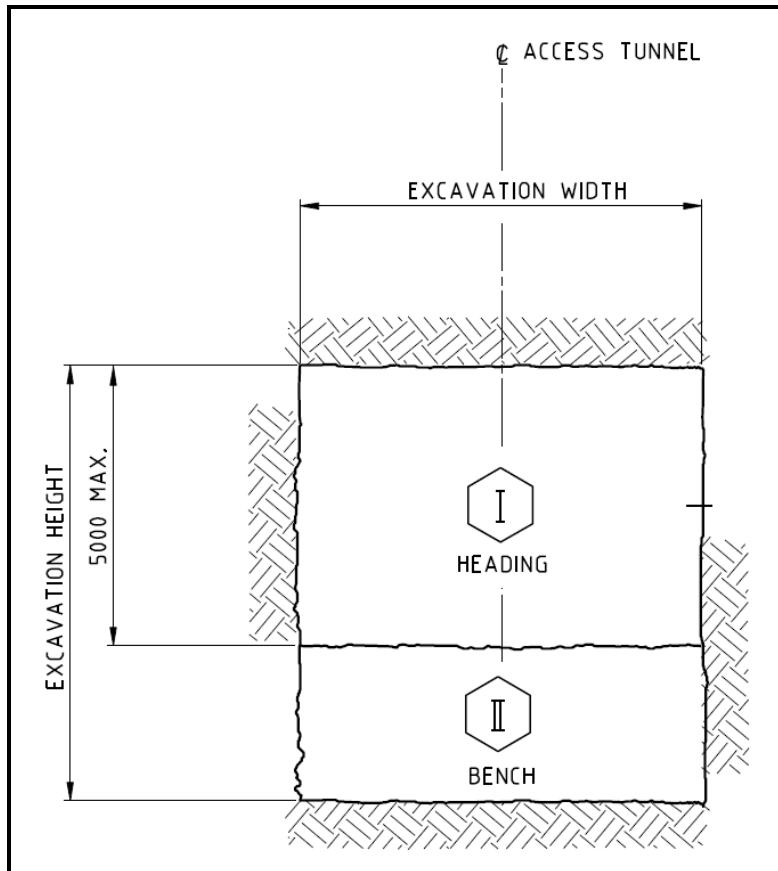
Proposed Heading and Bench Sequence to be Used for Access Tunnels
